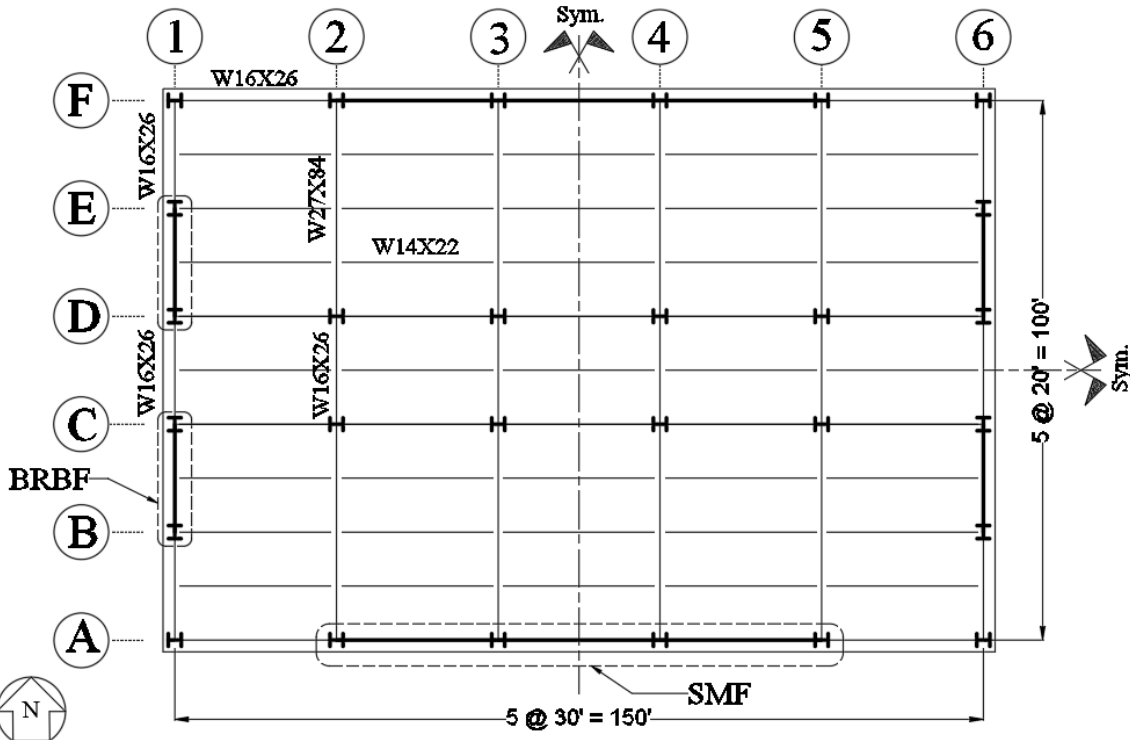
Typical floor framing plan for the 4- and 8-story archetype buildings (Speicher & Harris, 2020).
